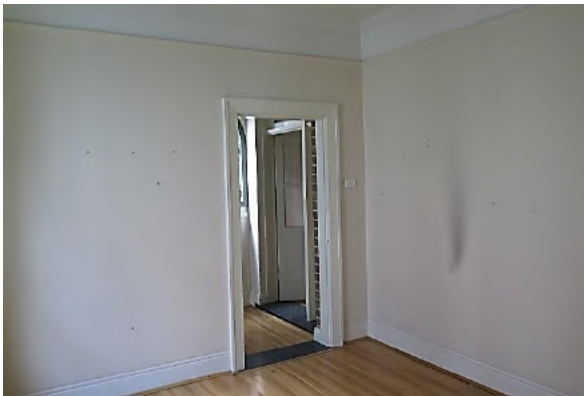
Rear bedroom (space G.6) showing modern timber flooring, original timber framed opening, architrave, cement rendered skirtings and timber picture rail. (Source: GML Heritage, July 2016)
